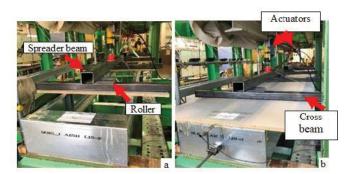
Typical load configuration for the bare frame (a) and composite cassette (b)
